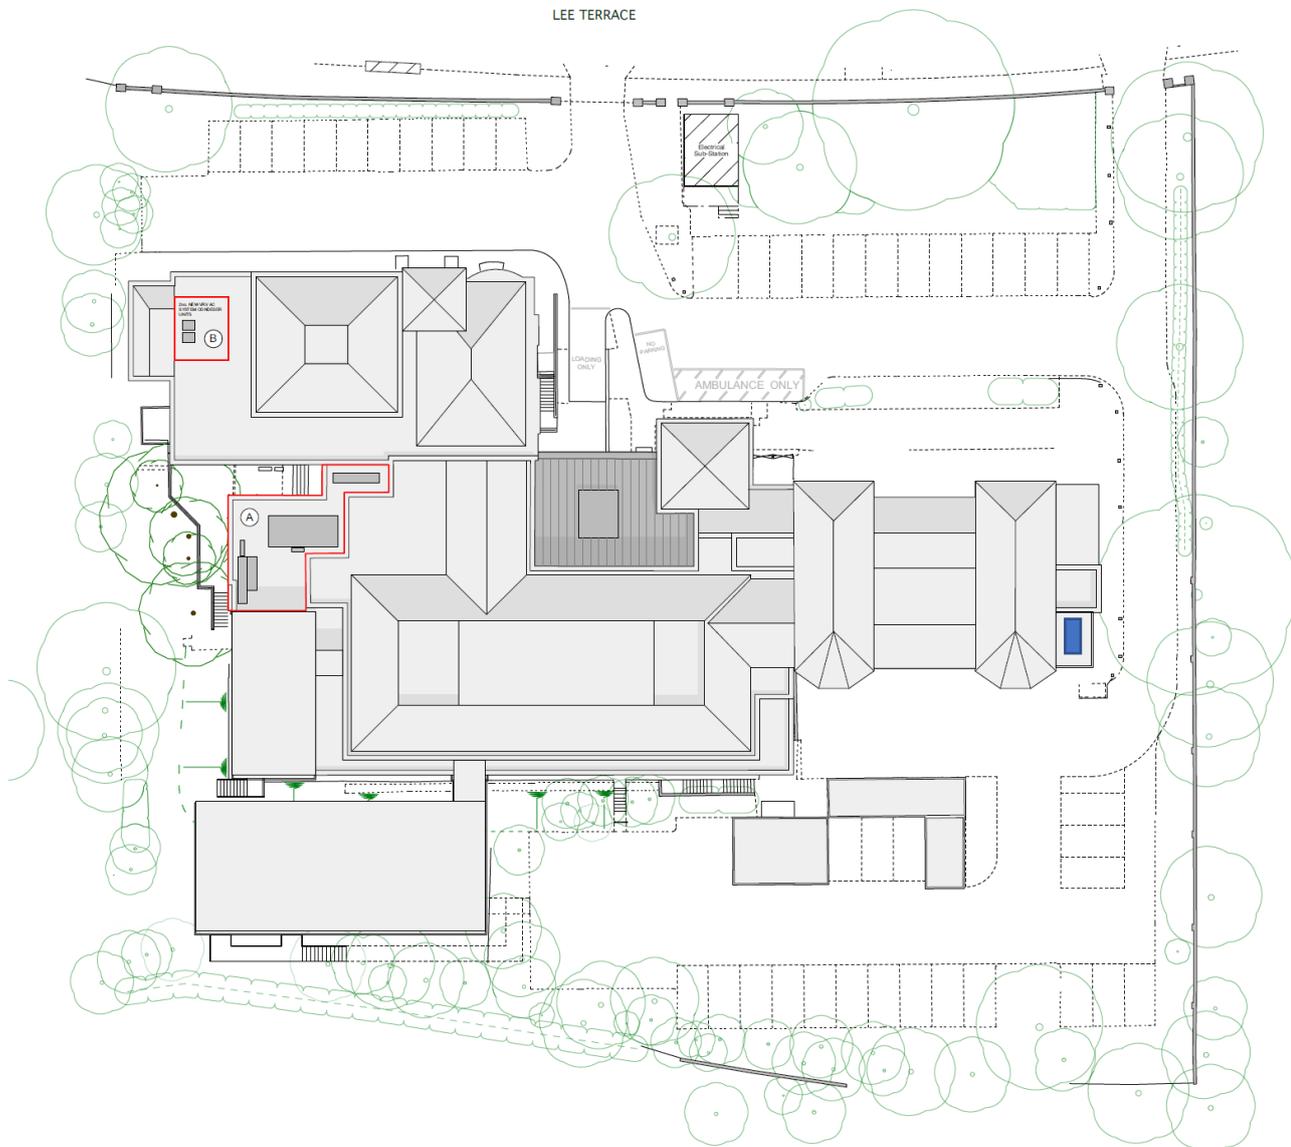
Location plan showing the position of the proposed plant equipment in red and the location of the existing MRI cooling system in blue.
